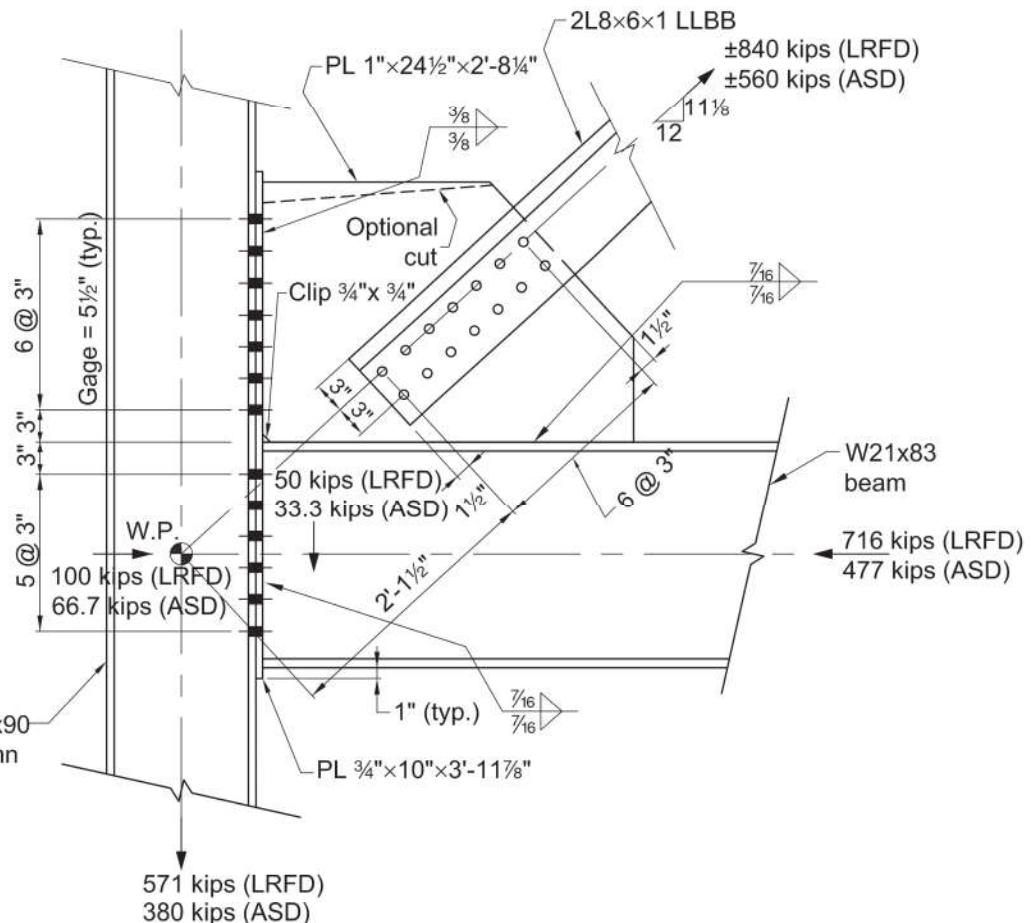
Strong axis bracing connection—general uniform force method.
